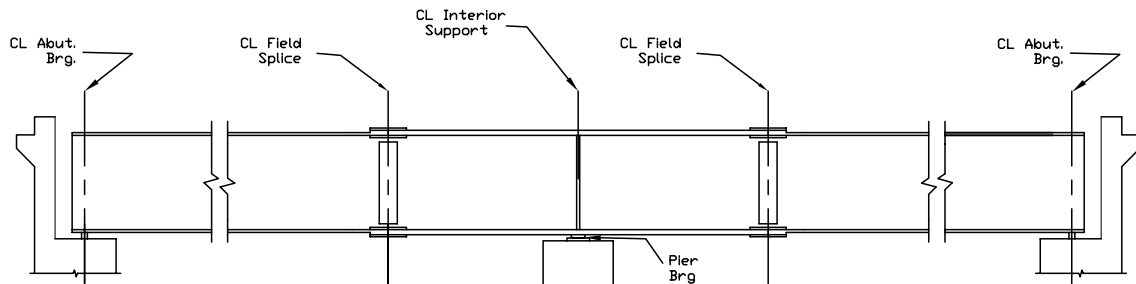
Conventional Two-Span Continuous Steel Girder
